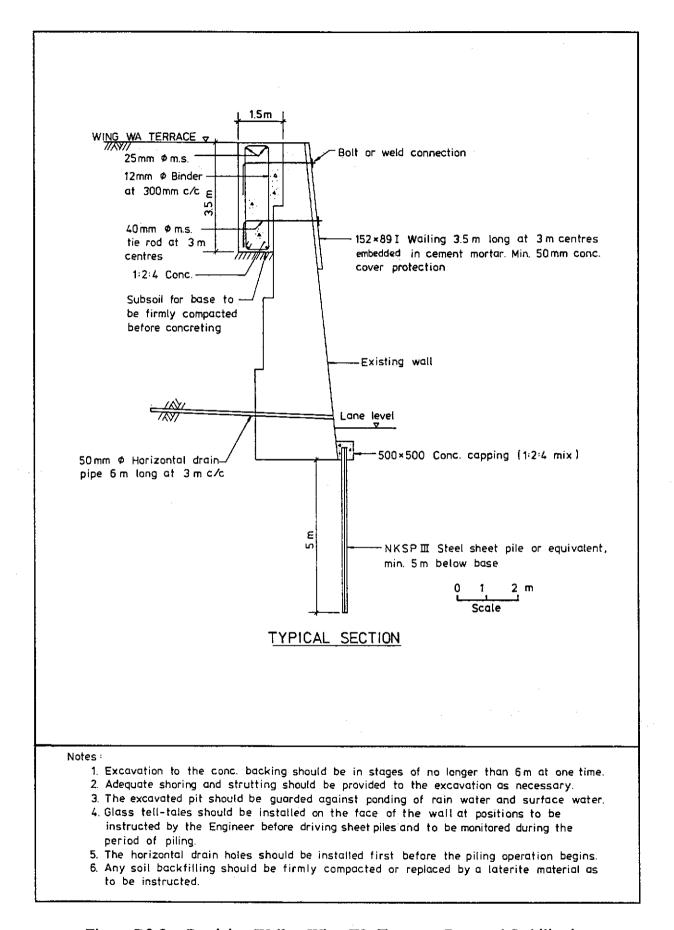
Retaining Wall at Wing Wa Terrace - Proposed Stabilisation
